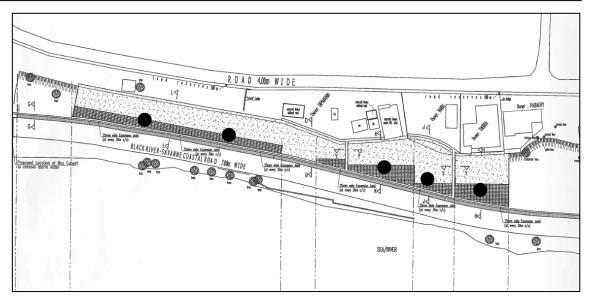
Diagram of the starting point of the countermeasure works (below: crib wall works, beneath: shotcrete works) (• in the diagram shows sites of drilling survey) (Source: JET)
